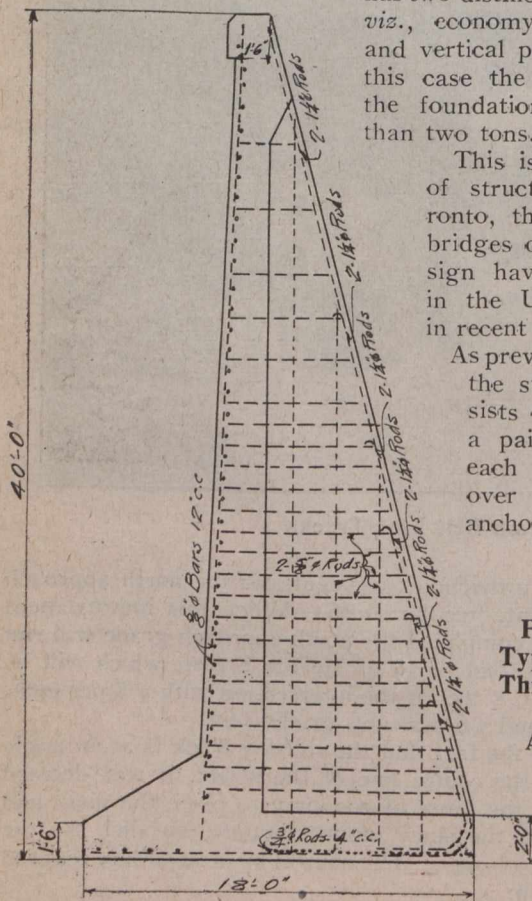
Typical Section Through Wing Wall of Abutments
